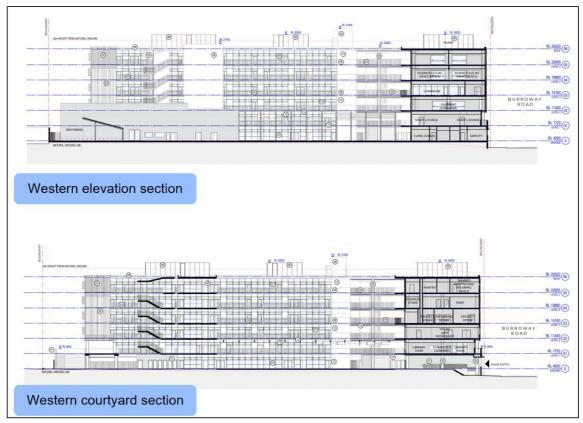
| Amended development - sections from the western elevation and internal courtyard (Source: Applicant's AR 2022)
